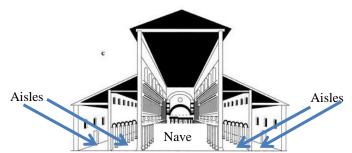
Basilica Section, Nave and Aisles (URL 6)
